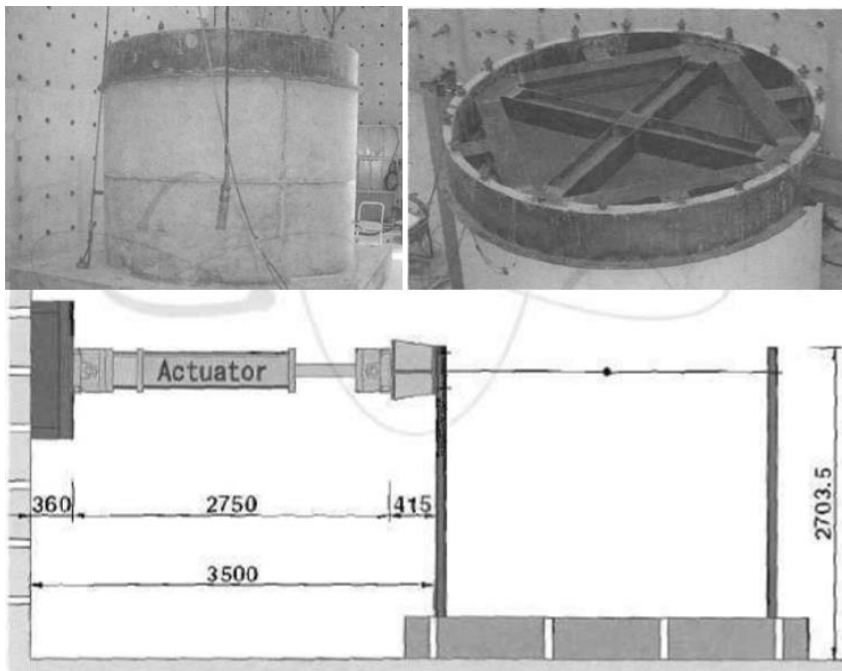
Test specimens and set-up (Cho et al (2007))
